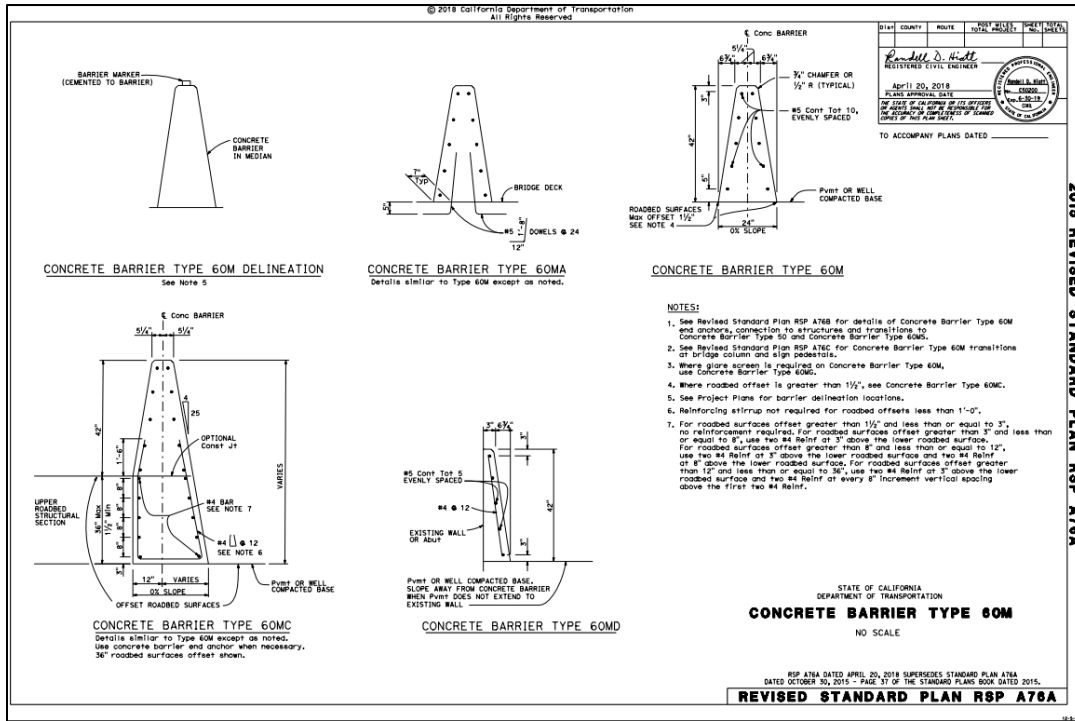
Standard Plan RSP A76A for Concrete Barrier Type 60M [5].
